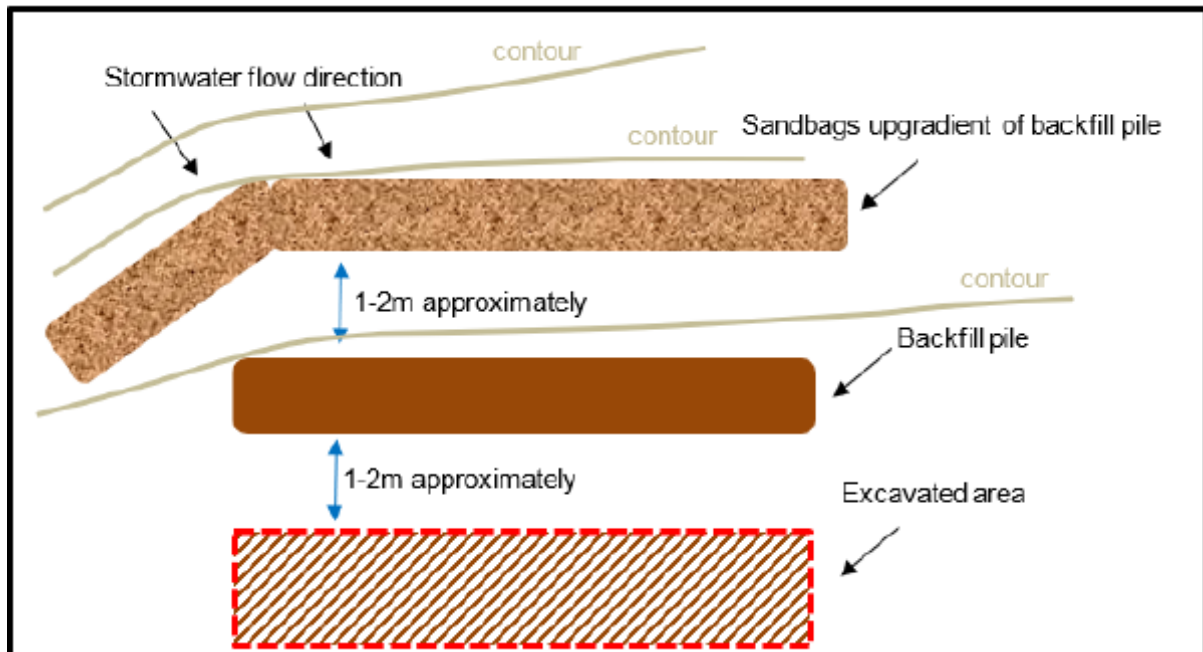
Site specific example layout of typical trench / excavation working section
